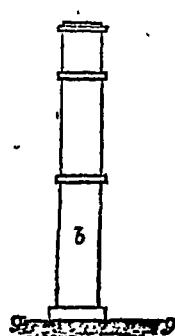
is the side elevation and figure 90 the front elevation of a buttress to strengthen a wall at the Imperial Forest School, Dehra Dun. a is the wall which is strengthened, in section; b is the buttress, g the level of the ground. The foundations of the buttress are not shown. Scale 12 feet = 1 inch. (drawn by U. N. Kanjilal.)
